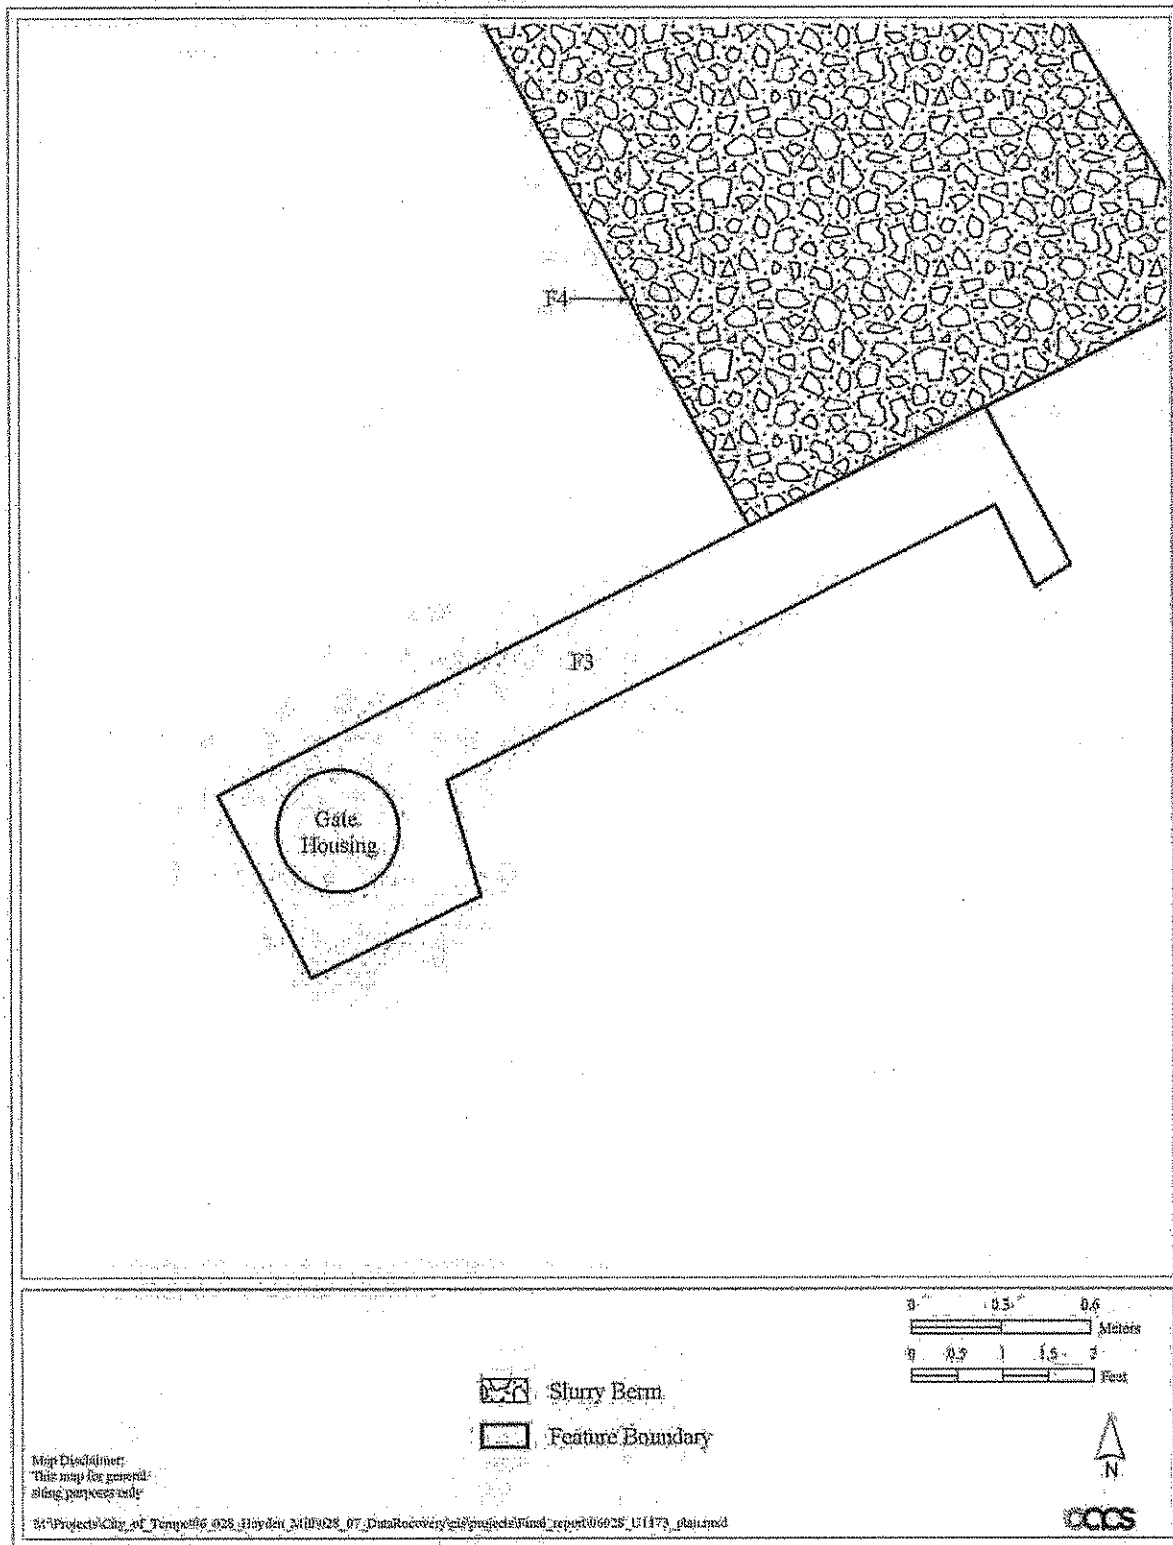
Plan view of concrete check/drop structure Feature 3, Hayden Ditch site (AZ U:9:189[ASM]).
